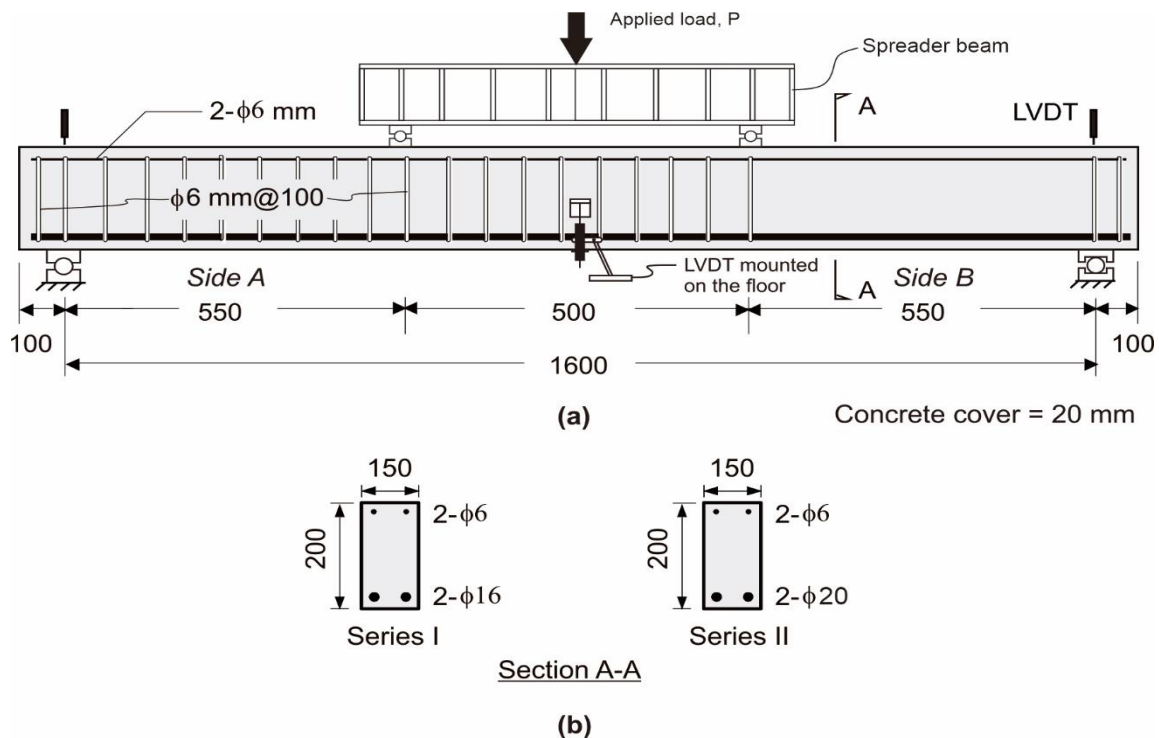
Details of beams: (a) elevation, test setup and instrumentation, (b) reinforcement.
